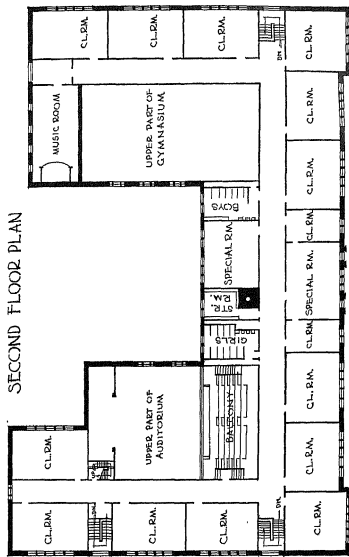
SECOND FLOOR PLAN, PARLEY COBURN SCHOOL, ELMIRA, NEW YORK.
